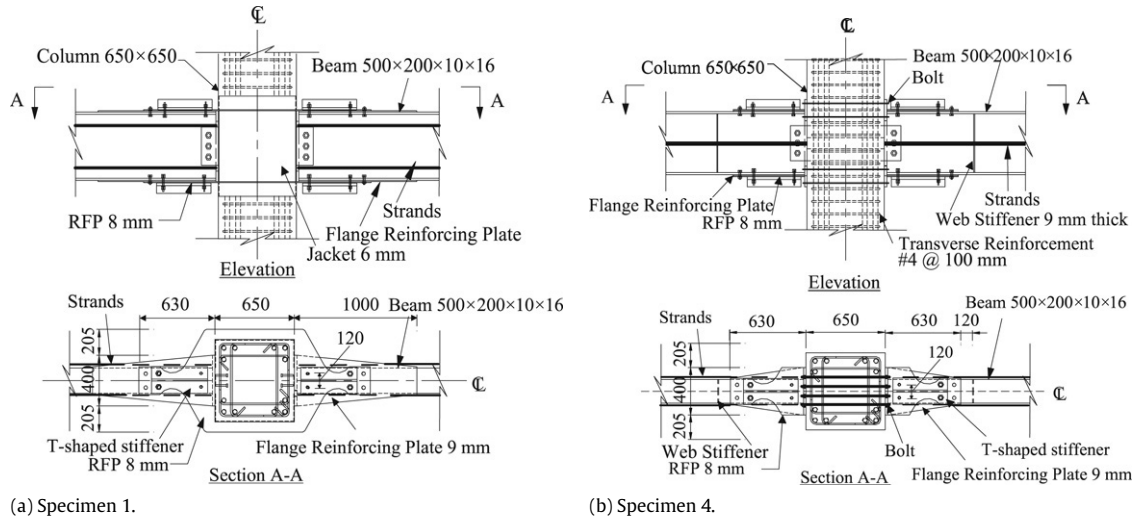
Specimens 1 and 4 connection details (unit: mm).
